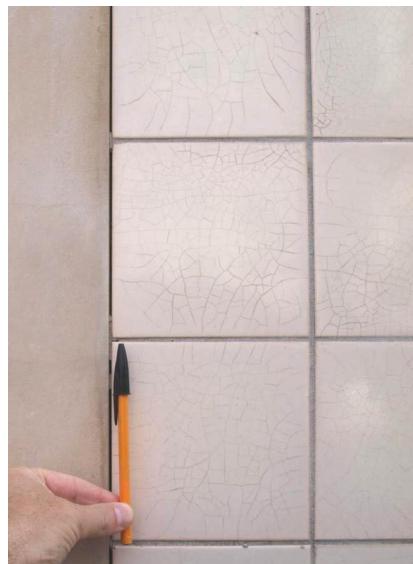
Cracking in façade tiles (Porto, late 1990s).
